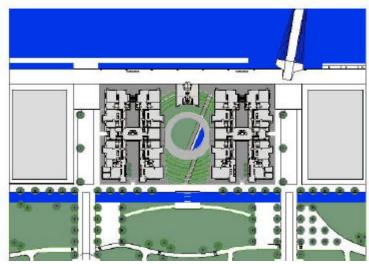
Site plan of SBC's Kobben block, Hammarby Sjöstad, Stockholm.
